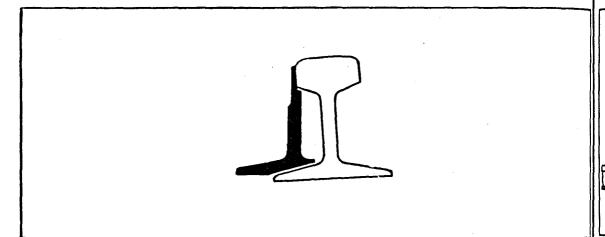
POINT BASE & SWITCH TOE SECTIONS
